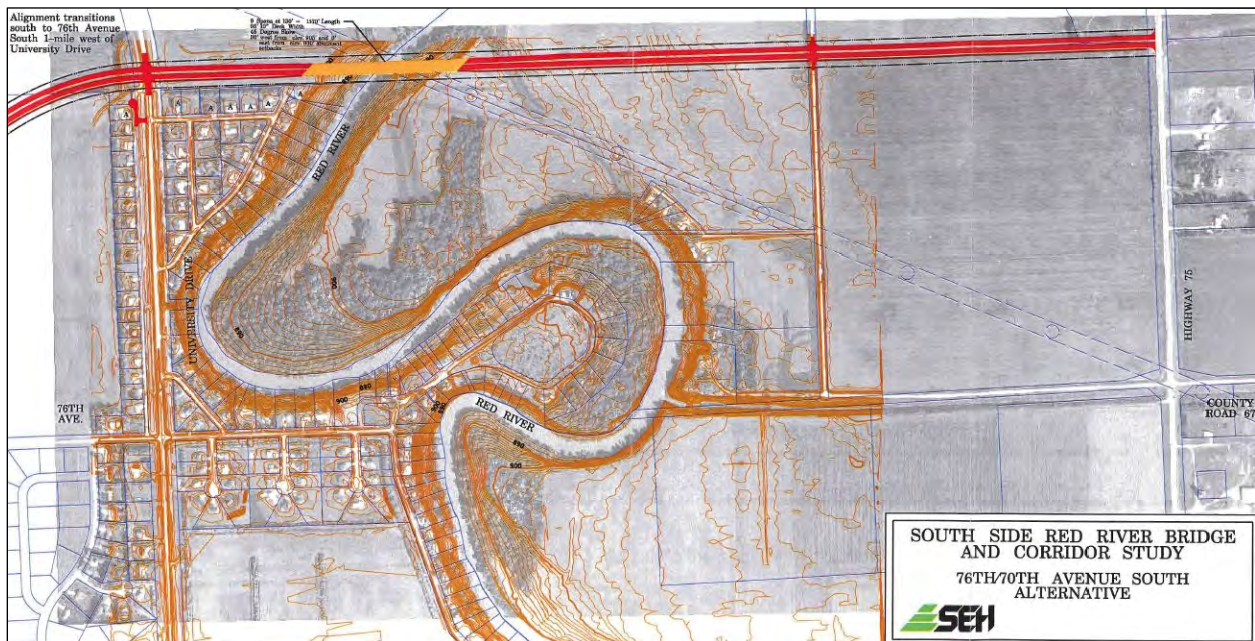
B: 76th/70th Avenue South Alternative (Source: Red River Bridge Corridor Study)
